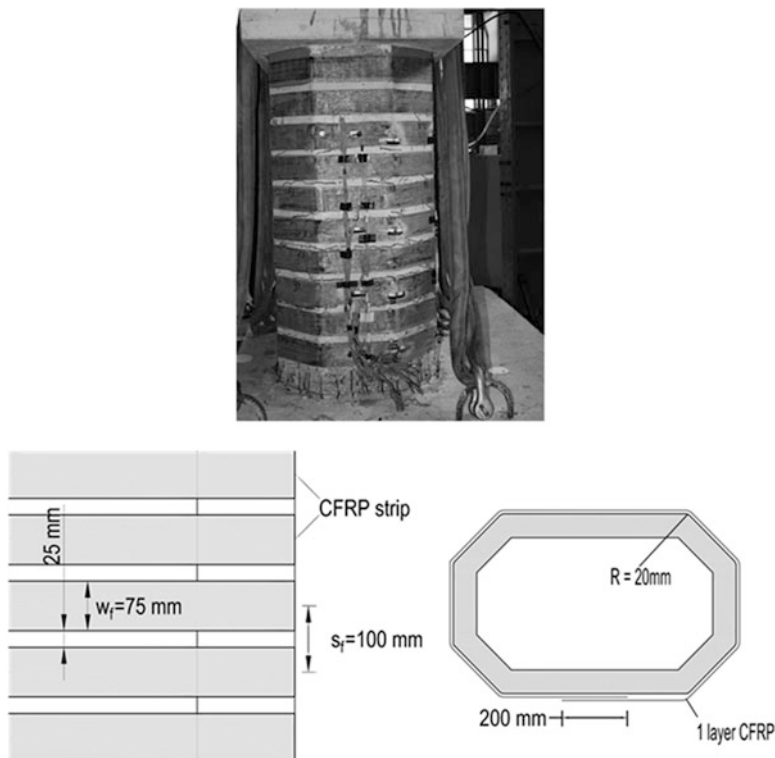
Strengthening of the column, using CFRP strips – the test specimen
